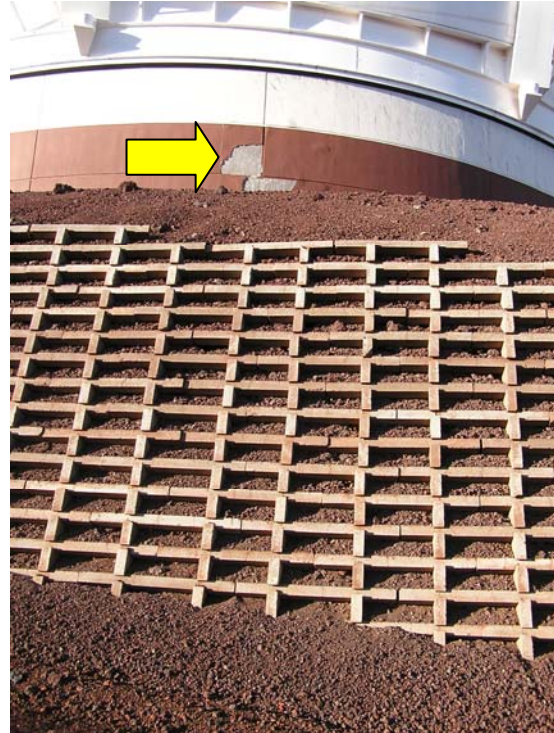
Location 28, Keck Observatory, Mauna Kea summit. No apparent distress to high embankment beside the observatory. Spalled stucco evident at two places on the exterior wall of the building (one arrowed).
